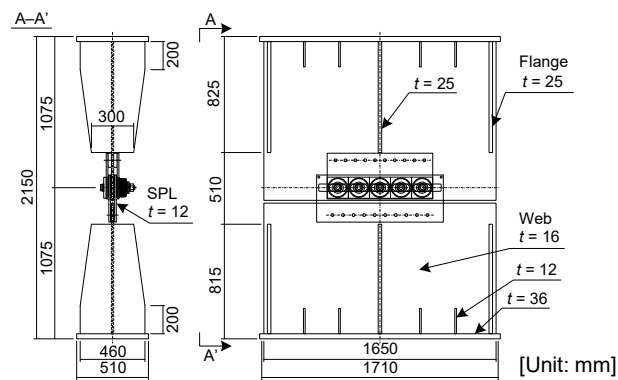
Elevation drawings of a stud-type multi-unit friction damper specimen, Specimen S-3, used in full-scale tests¹⁾
